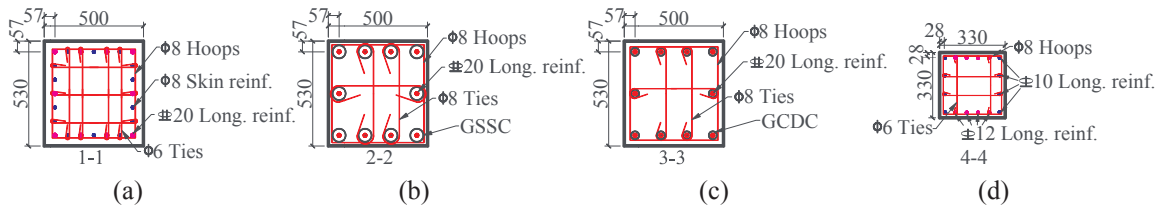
Reinforcement arrangements and connection details: (a) Column; (b) GSSC; (c) GCDC; (d) Tie beam.
